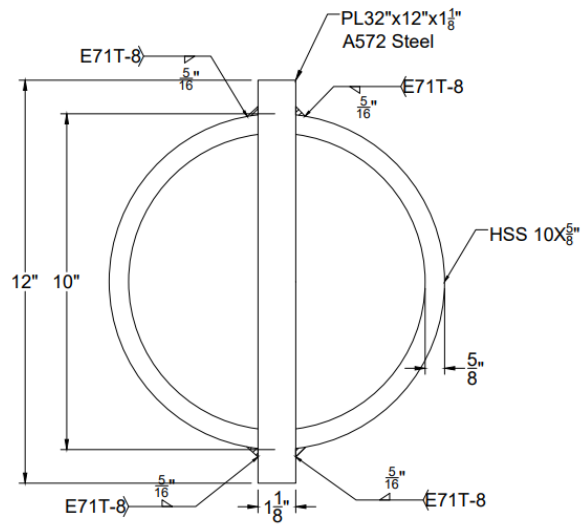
Cross section view of the steel plate within the HSS 10x5/8 tube.
